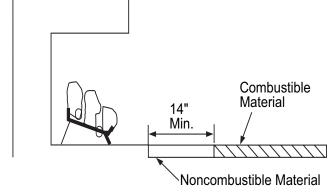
Minimum Fireplace Clearances If Installed at Floor Level
